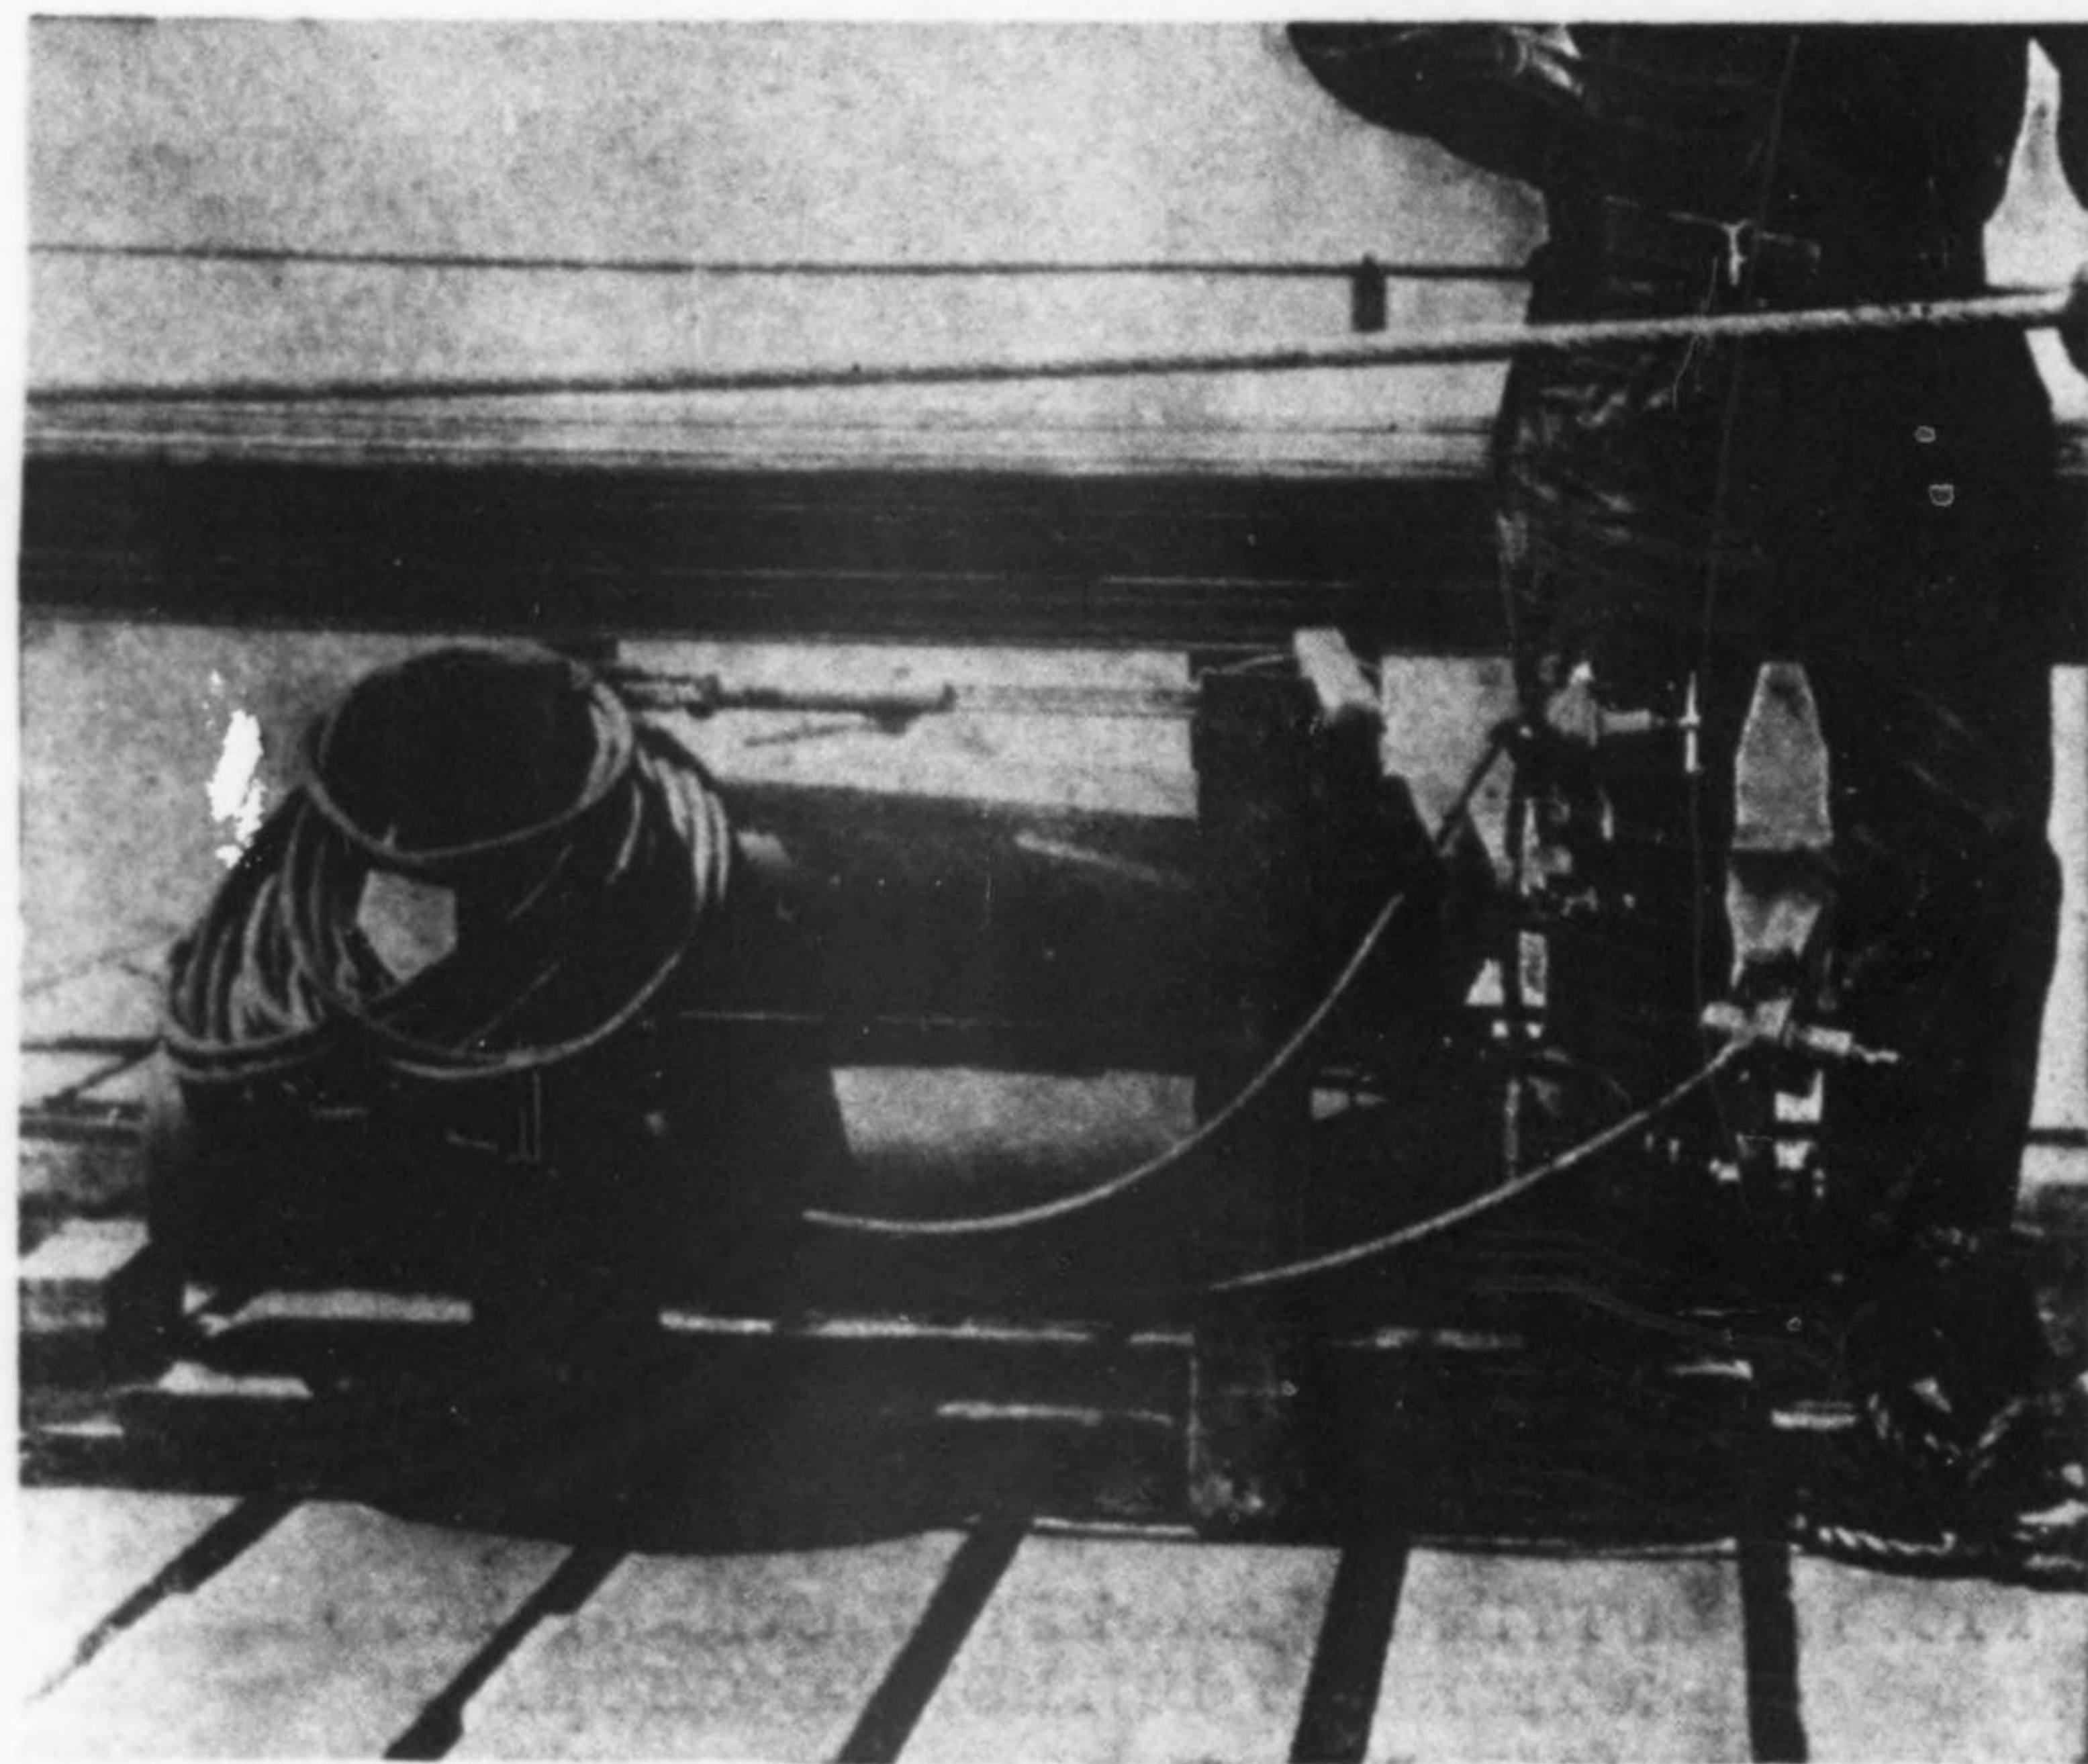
FLAME-CUTTING OUTFIT USED ON MAIN SPAN AT DETROIT
